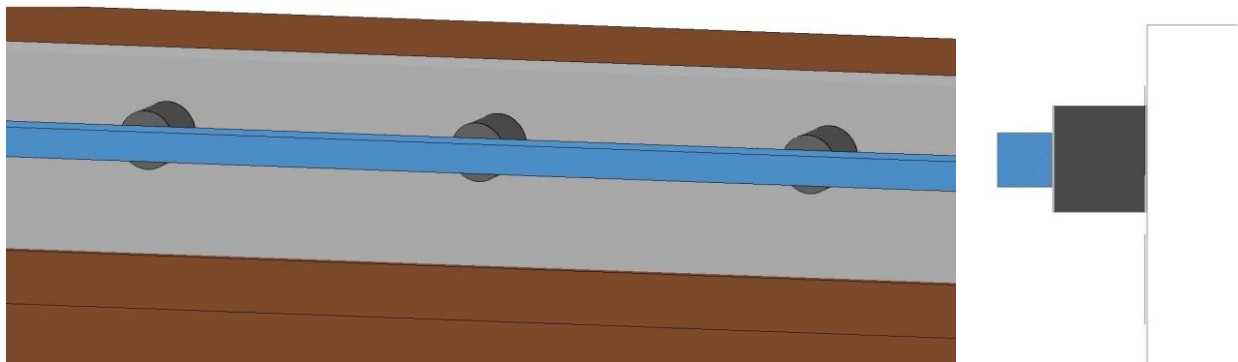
Axial Energy-Absorber Retrofit on a Vertical Concrete Wall
